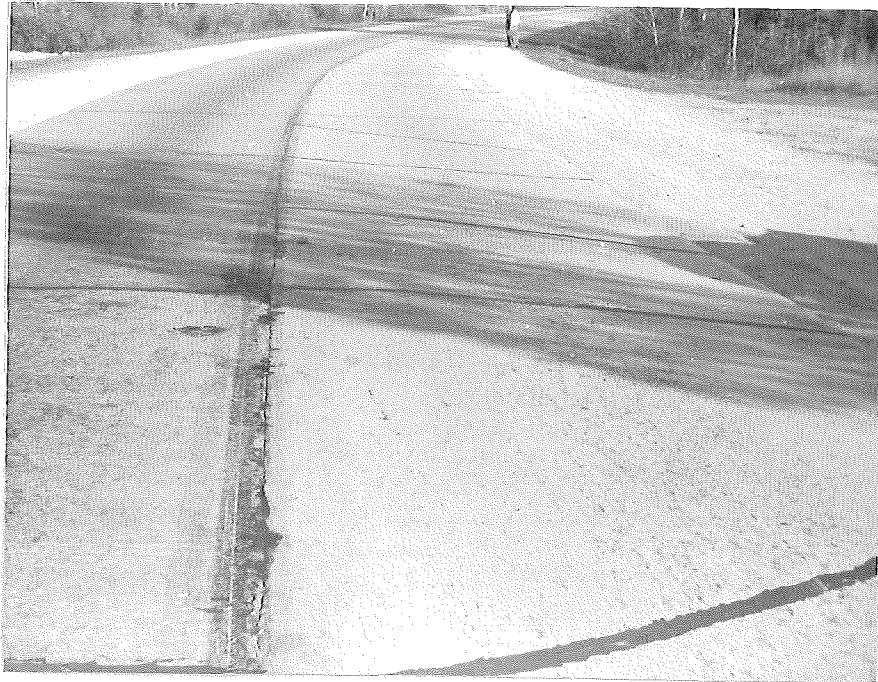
Cracking of patch in right lane at station 204+00 looking north. Note that cracks follow crack pattern in old concrete of adjacent left lane.
